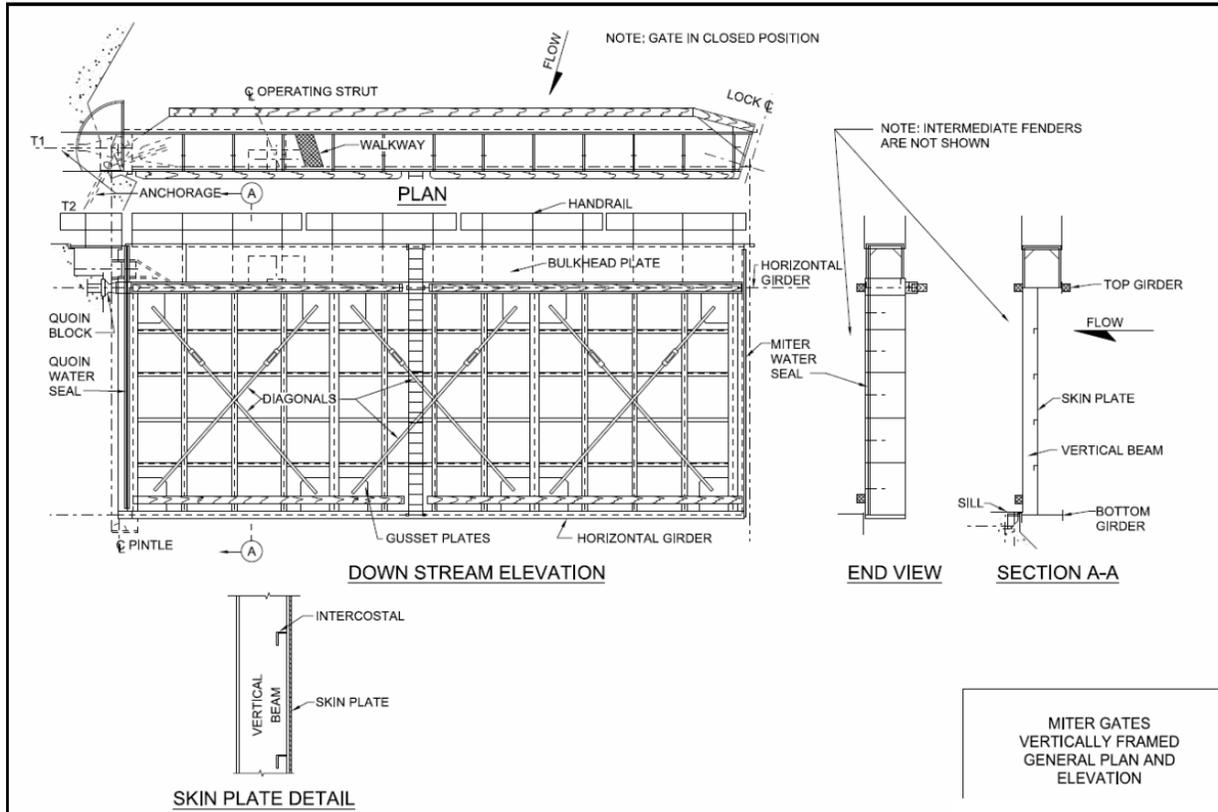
General plan and elevation, vertically framed miter gates (USACE 2014).
